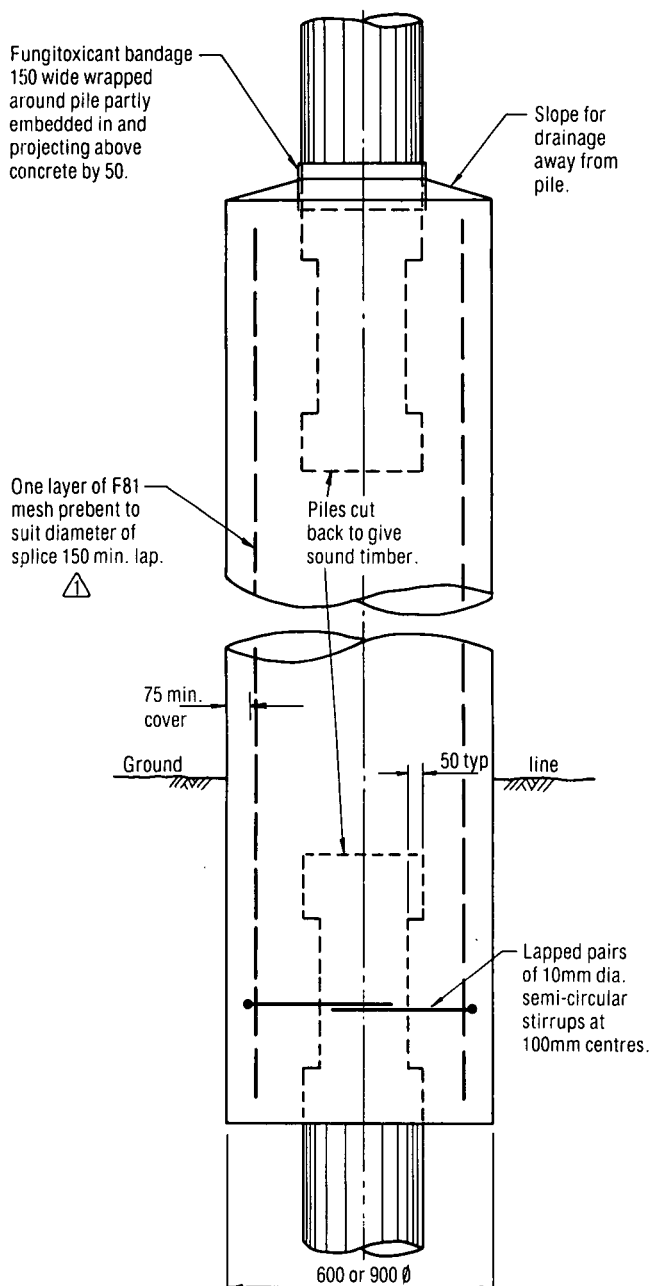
CONCRETE SPLICE FOR TIMBER PILES
